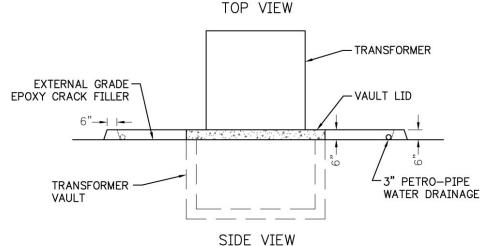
SPCC construction for transformers installed adjacent to a impermeable surface
